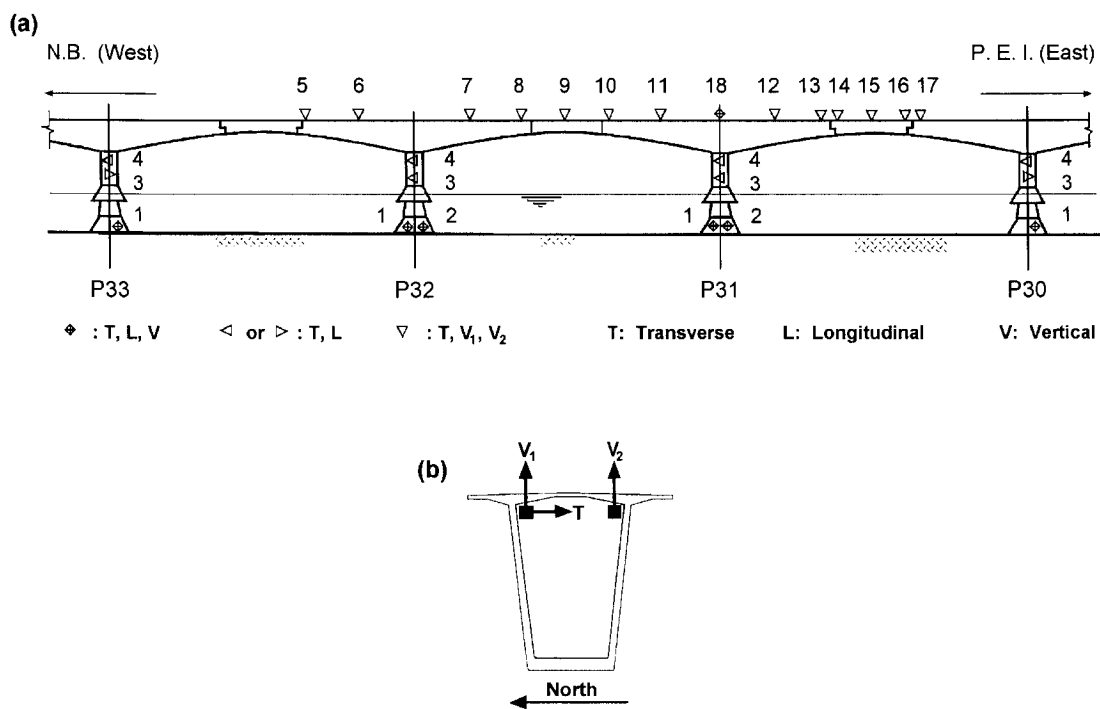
Locations of accelerometers: (a) instrumented sections of the bridge girder and piers, and (b) locations of accelerometers in the girder.
